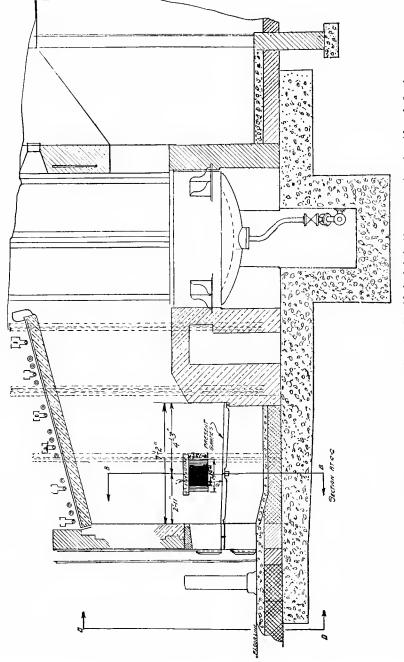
Liquid fuel injecting apparatus installed on open hearth furnace waste heat boiler.
